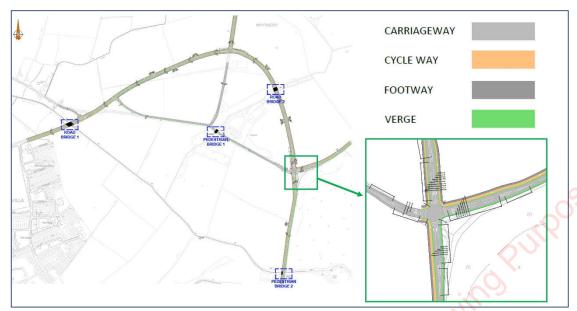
Route of the MOOR and an example of new proposed Junction/Crossroad adjacent to Site A – Imagery extracted from Planning Drawings (OCSC, 2022)
